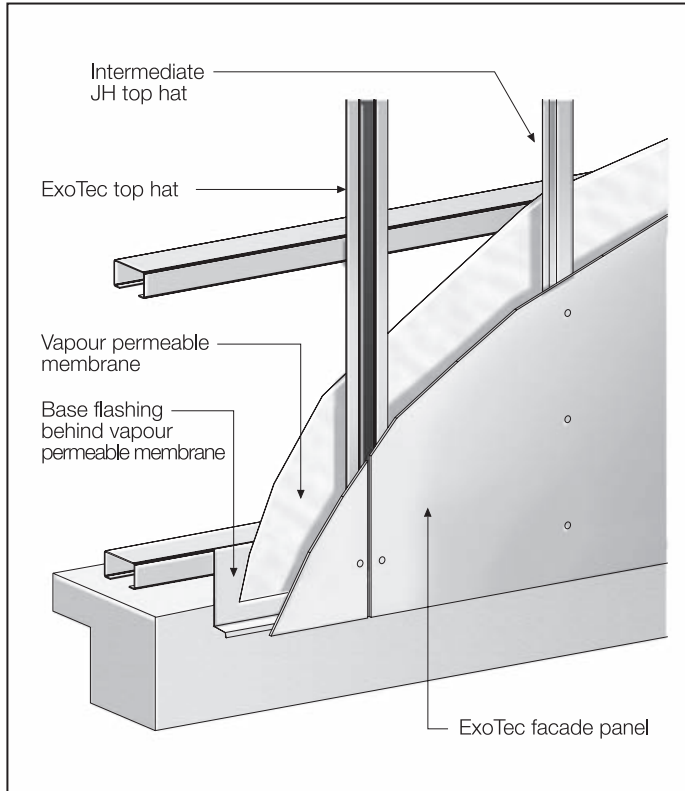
WALL BASE TYPICAL CUTAWAY DETAIL 1
